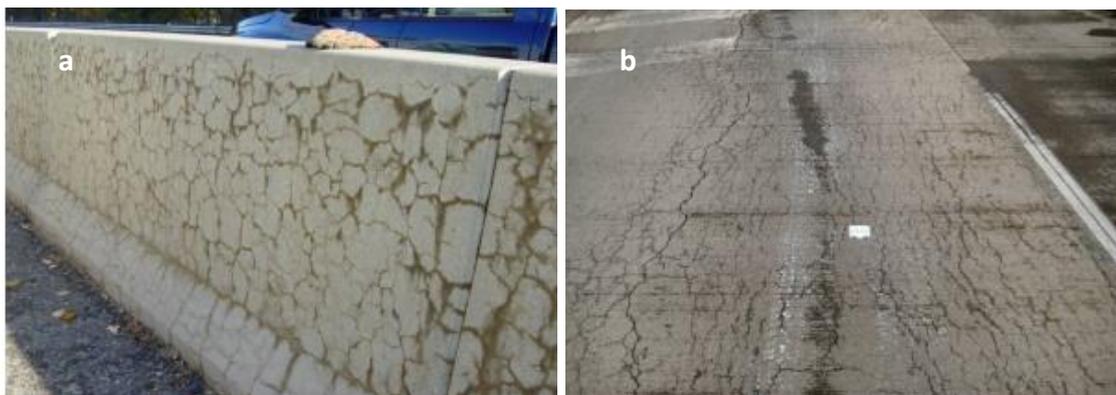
ASR gel cracking in concrete (a) Map cracking (b) Longitudinal and map cracking (124)
